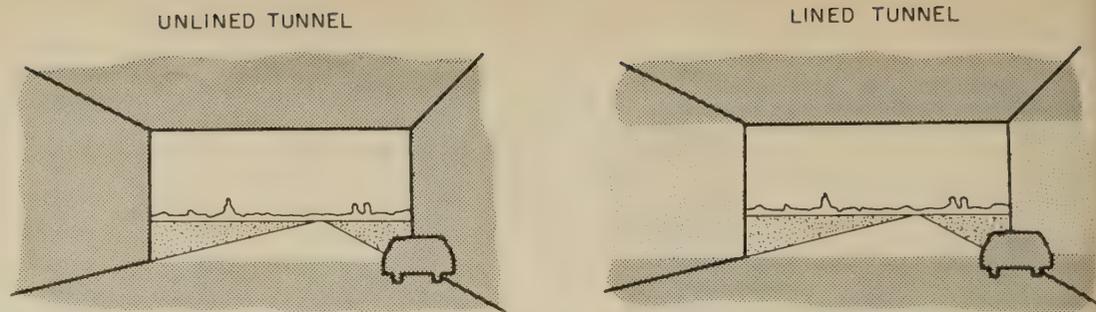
Effect of natural light penetration on walls at the tunnel exit.
